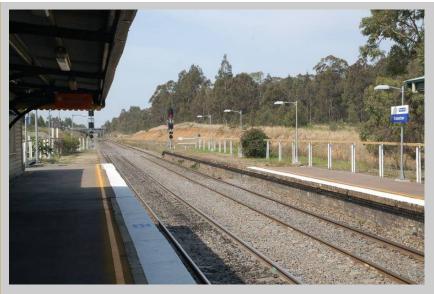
View to the east from Branxton Station. Proposed works would follow the railway alignment, on the south side of existing tracks.
